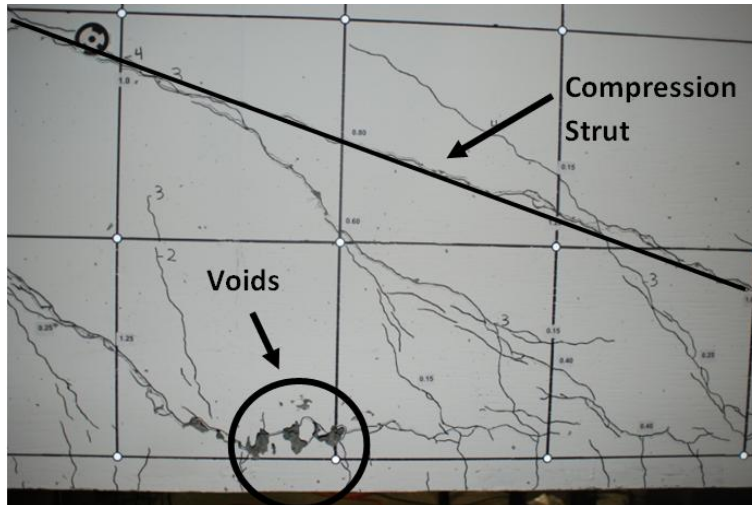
Voids and Compression Strut in East End of S1000-B1
